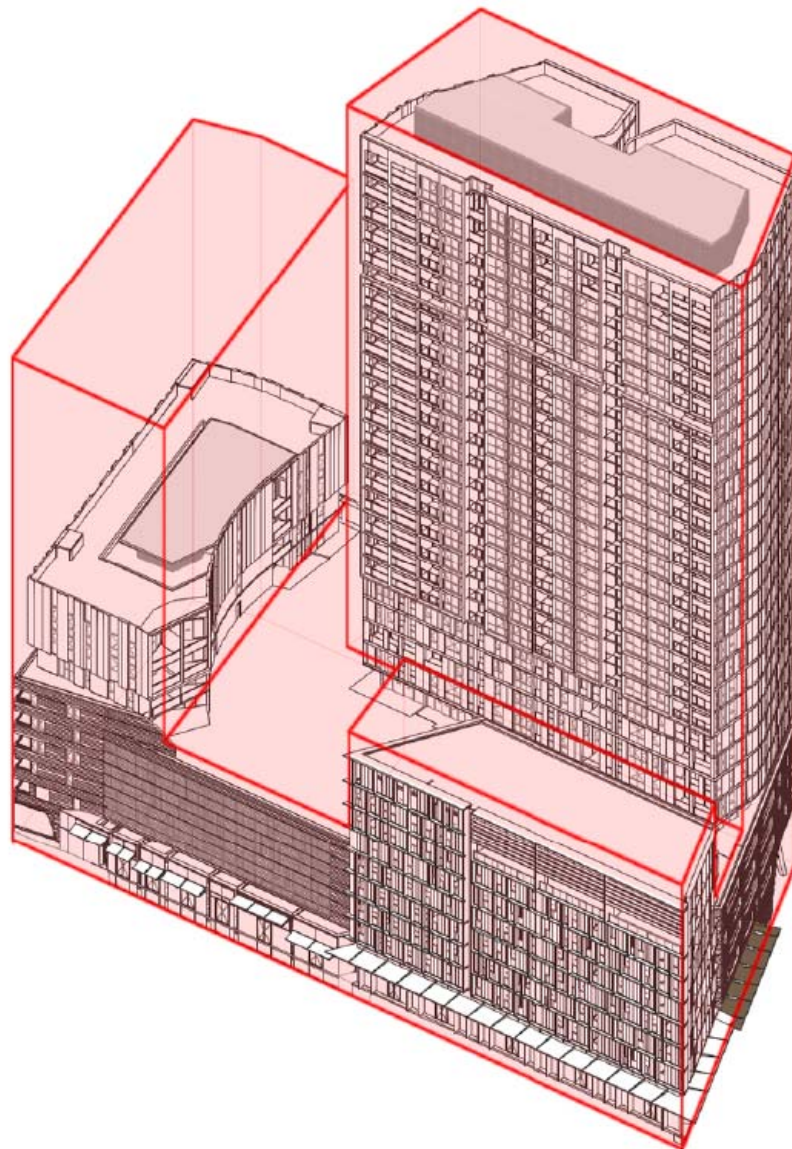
The proposal sitting within the Concept Proposal building envelope
